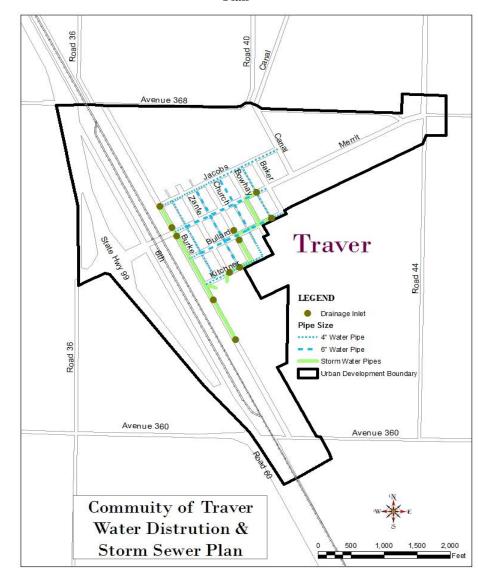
Community of Traver Water Distribution & Storm Water Sewer Plan
